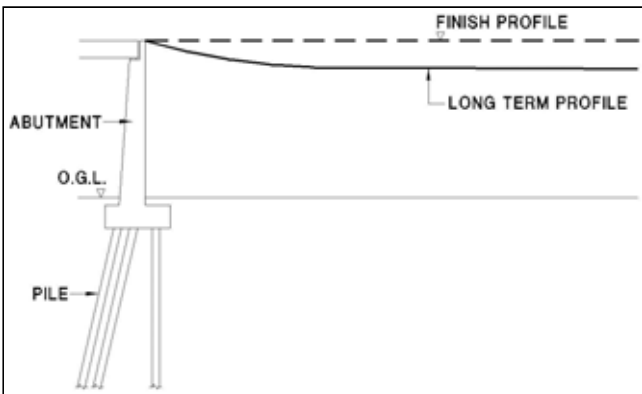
Settlement of a Bridge Approach (After Gue, 2000)
